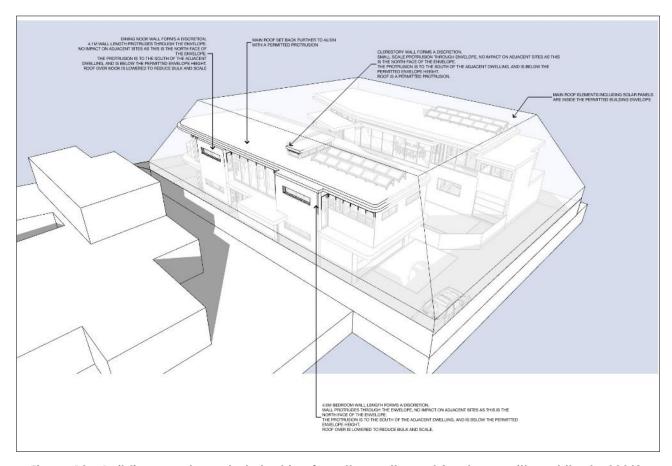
Building envelope study looking from the north-west (andrew smith architects, 2023)
